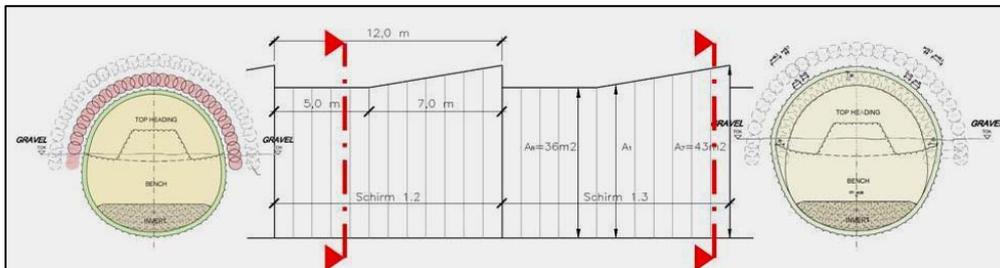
Jet Grouting Umbrella in Cross and Logitudinal Sections [10]
